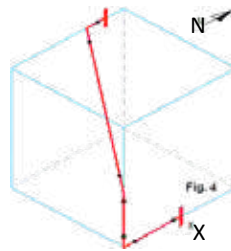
Isometric view of a pipe from one plane to opposite plane
